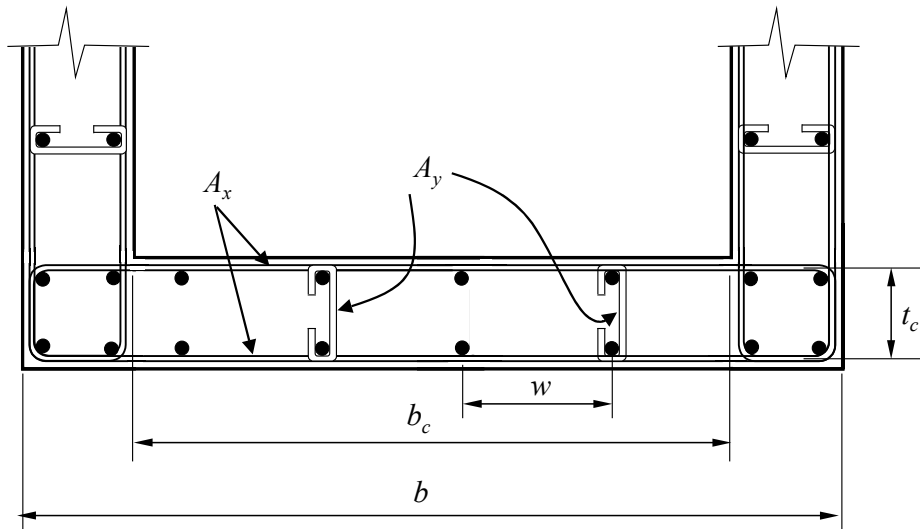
Geometry of the Slender Wall Subjected to Compression
